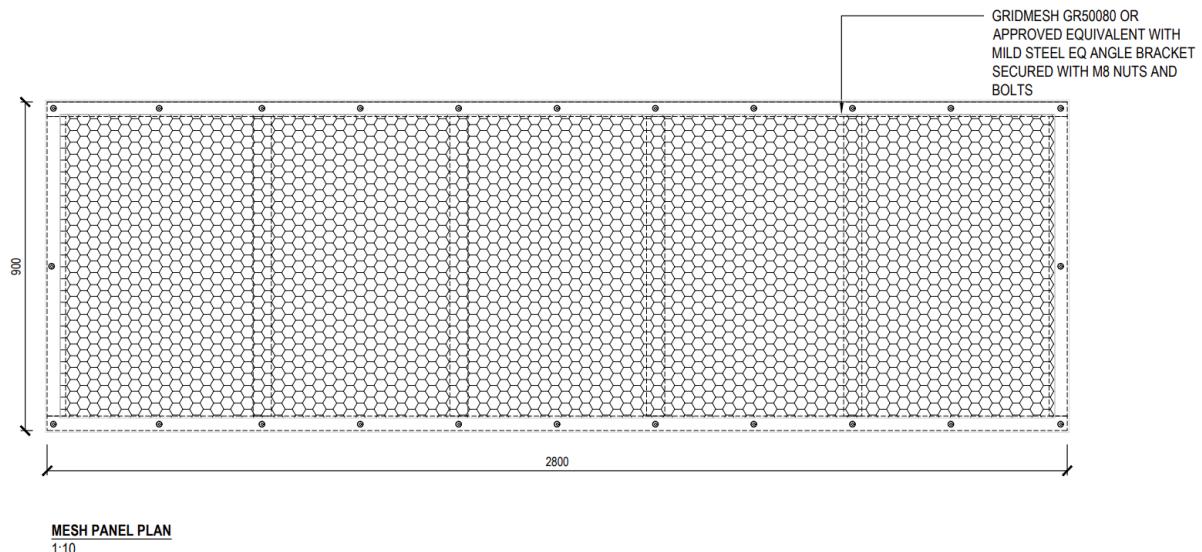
Design drawing of boardwalk mesh panels. (Source: Hansen for Parks Victoria, Kit of Parts: Track and Trail Elevated Walkway – Option 1, Drawing No. L.81.2005 T2, 19/06/2025)
